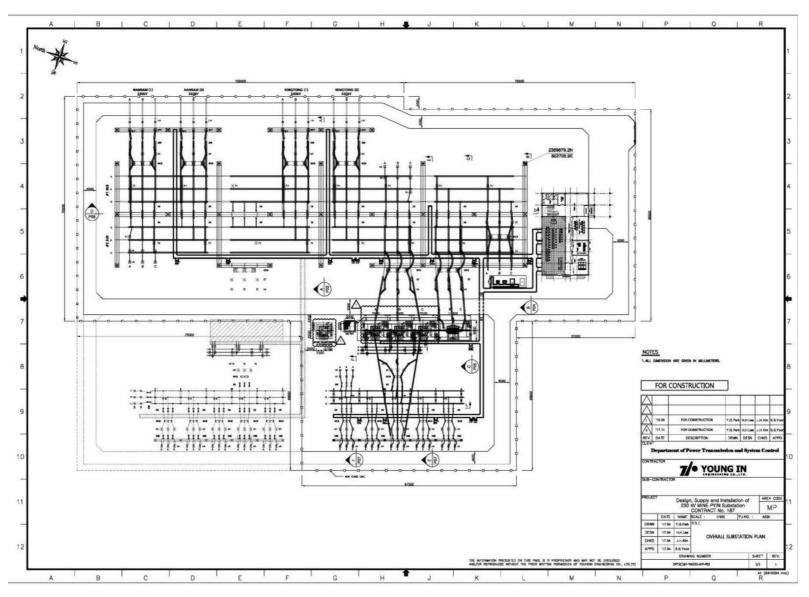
The Overall Substation Plan for proposed Mine Pyin Substation Project
